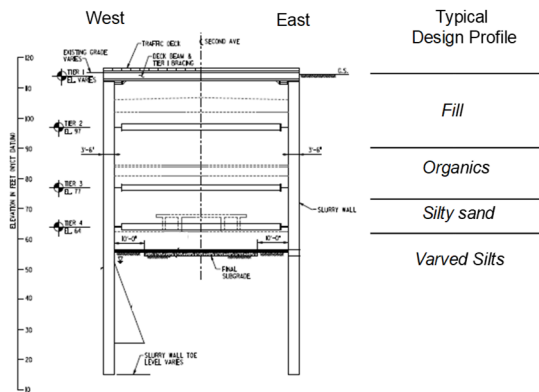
Typical floating diaphragm wall and lateral support scheme.
